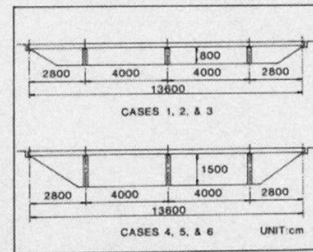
ELEVATIONS OF EXAMPLE FOUR-SPAN BOX-GIRDER BRIDGES
